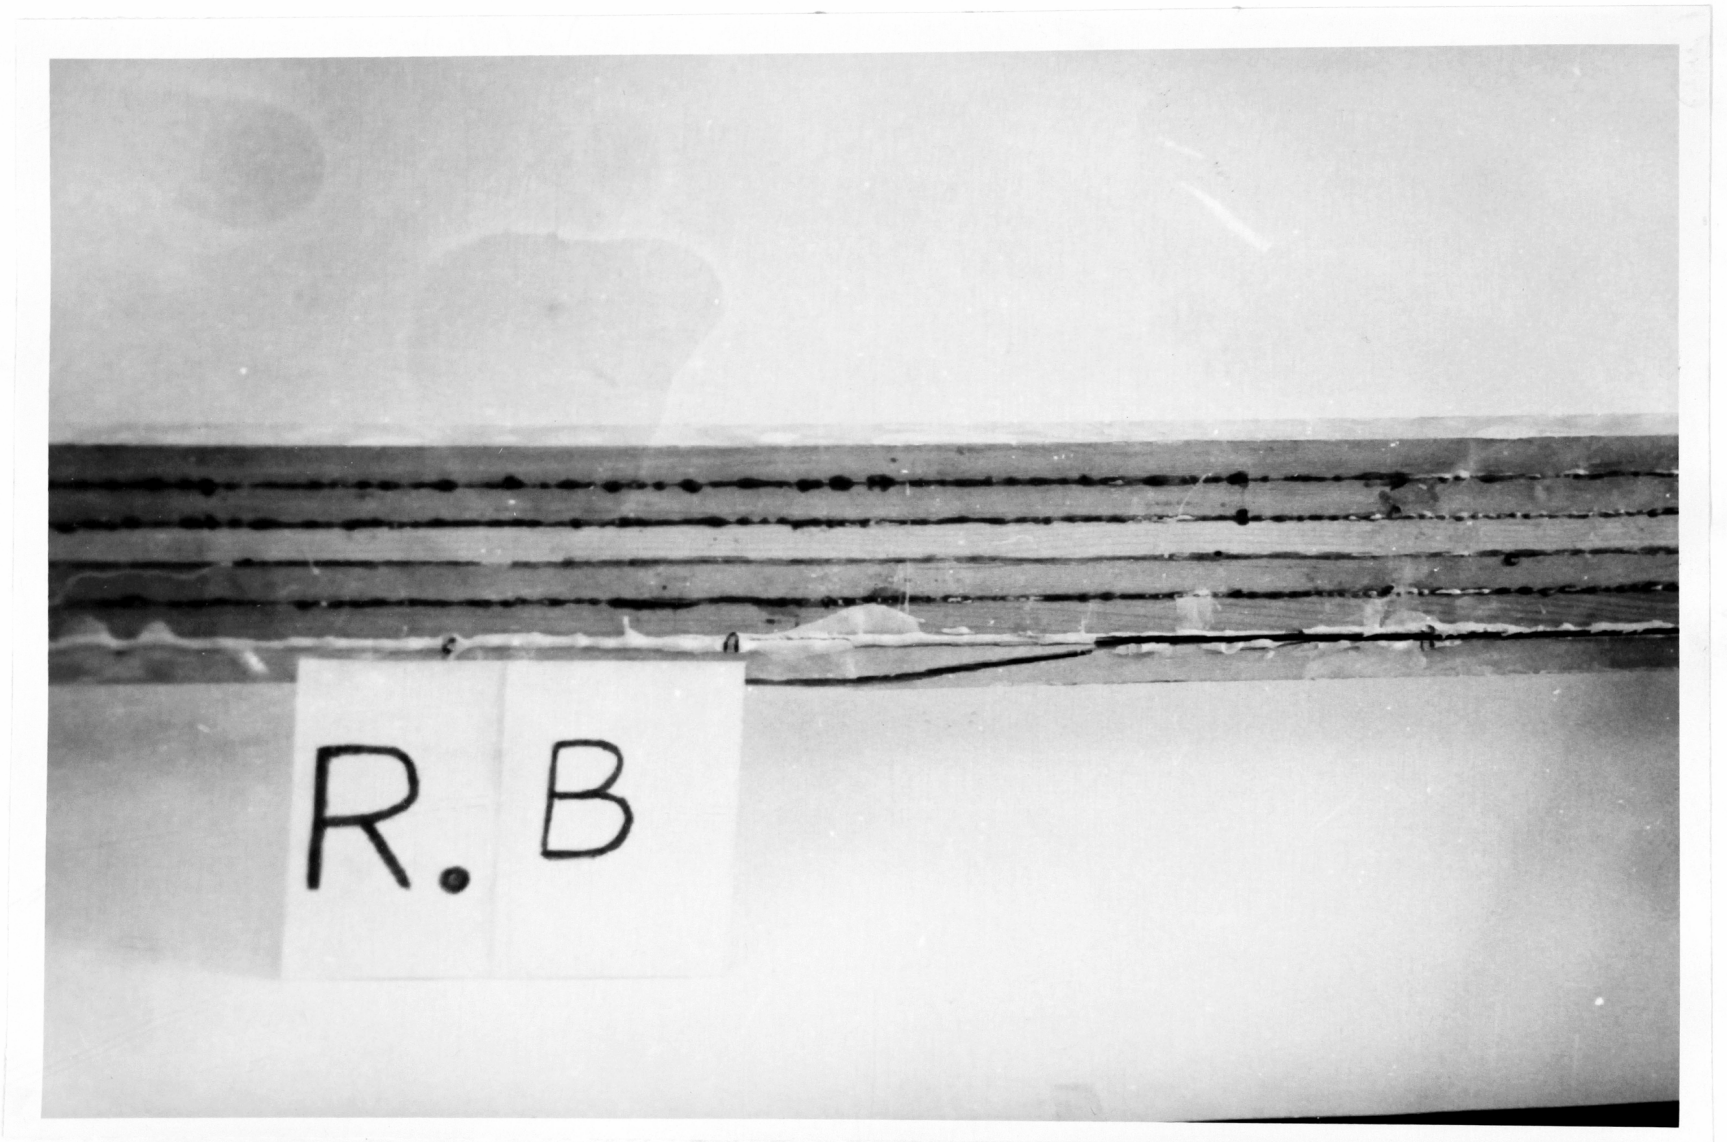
FIGURE IV TYPICAL FAILURE OF THE REINFORCED BEAMS, TYPE B
